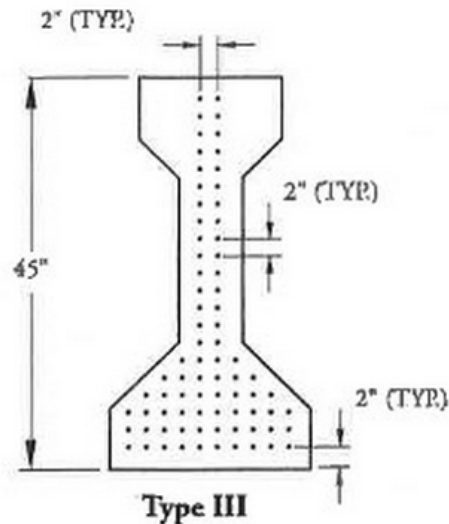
Prestressing strand layout for standard AASHTO Type III I-girder.
